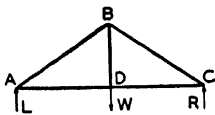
Skeleton Layout of Pin-connected Truss.
